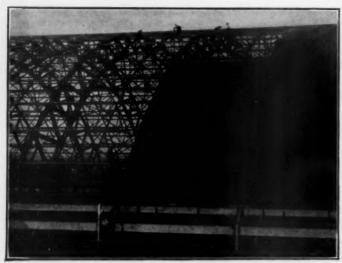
SIDE VIEW OF ROOF, SHOWING STEEL PLATE ROOF COVERING AND PURLINS
